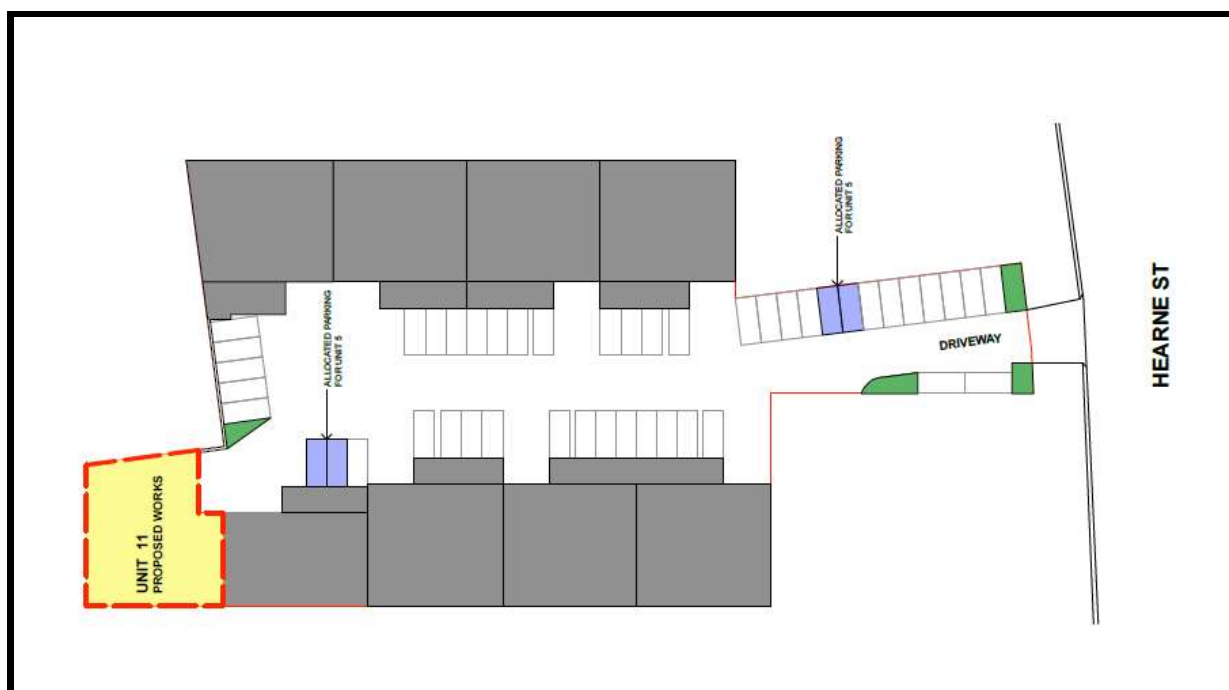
Existing site plan showing subject premises and allocated parking spaces (highlighted in blue) within the warehouse complex.
